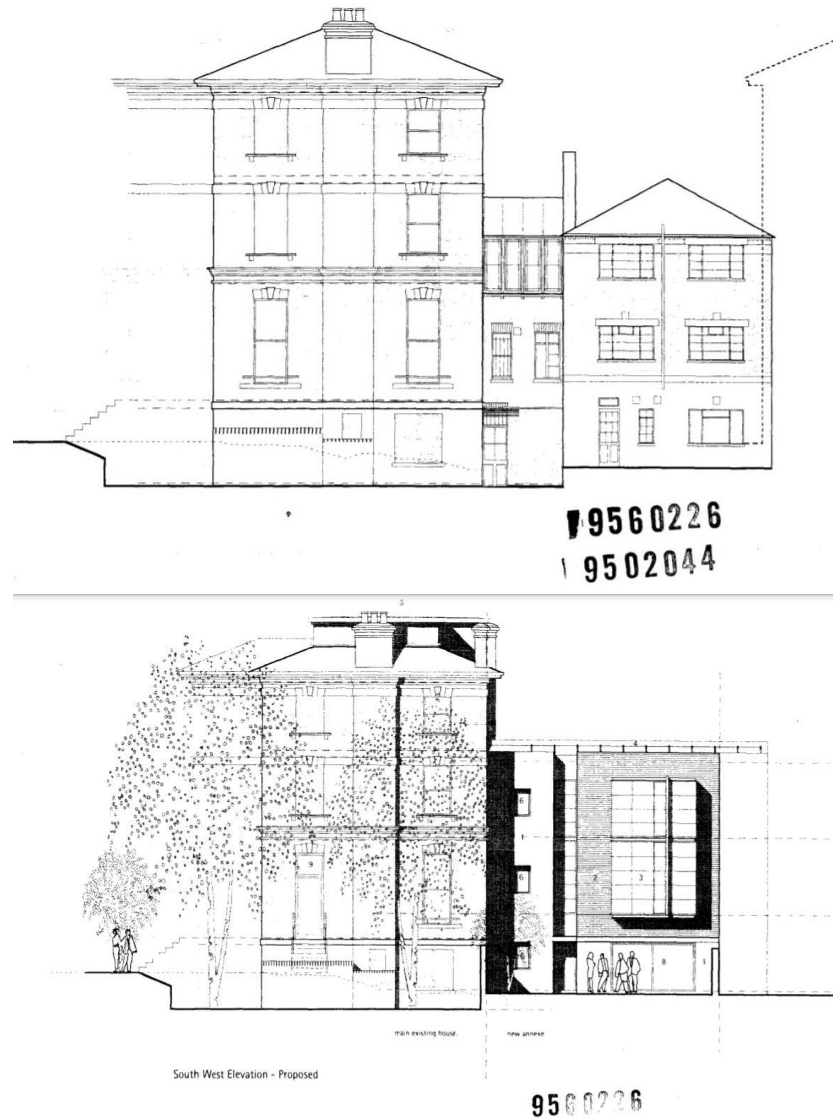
As existing and proposed south western elevations of St John's Studio site and link to St John's Lodge in 1995 (Camden online planning pages).
